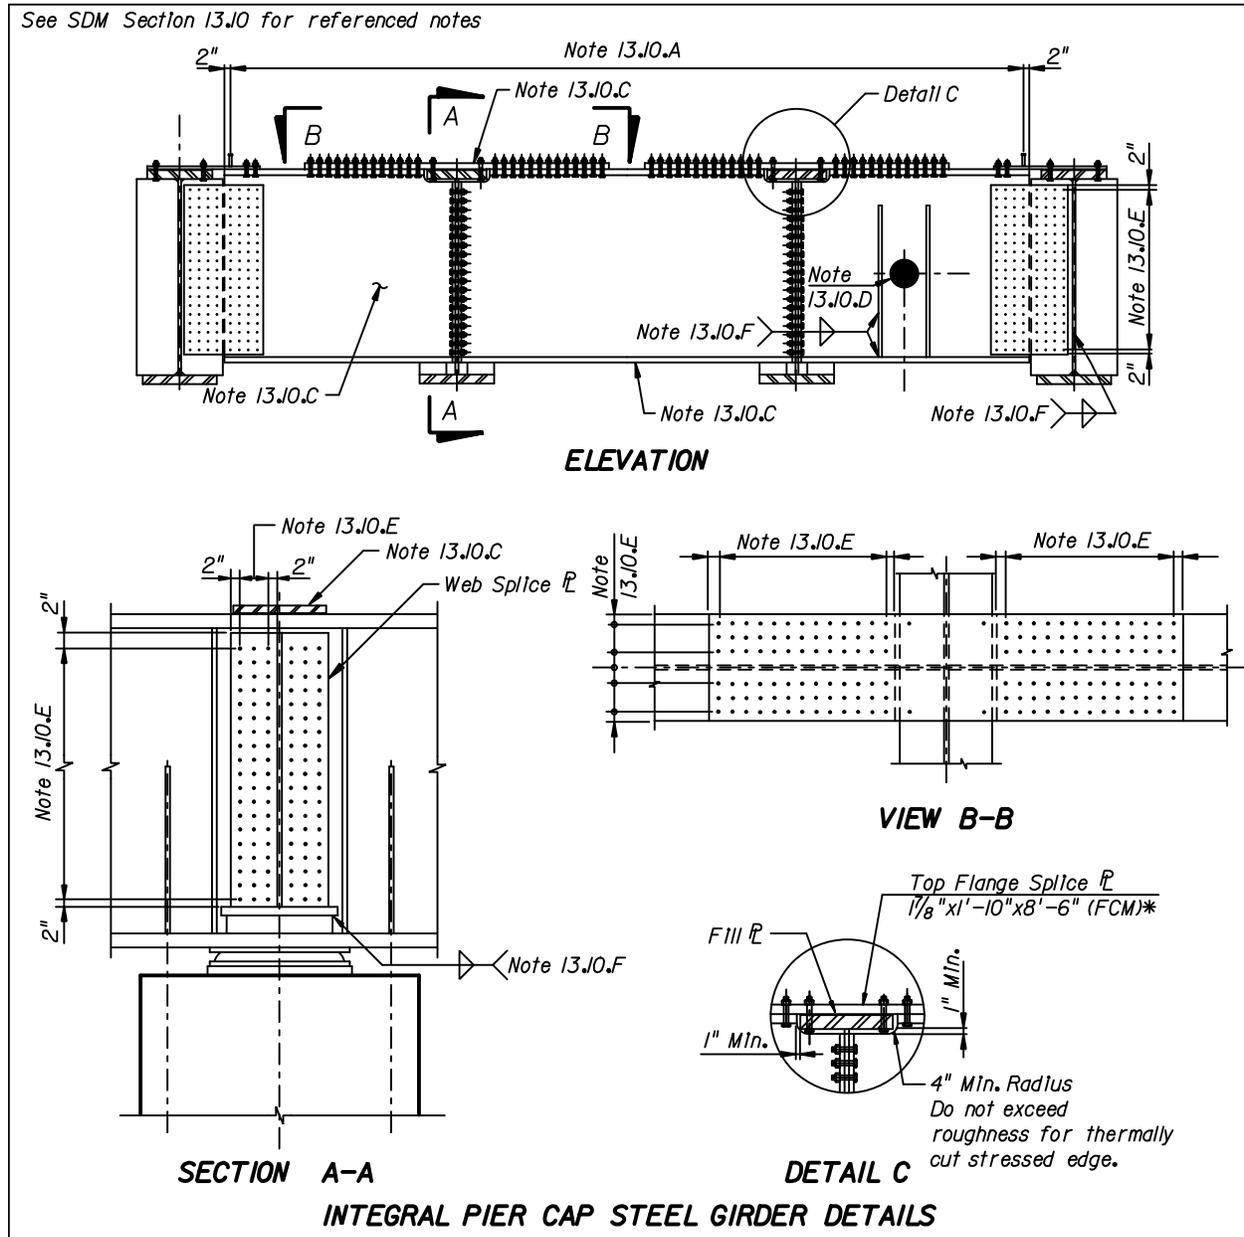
Integral Pier Cap Steel Girder Details
